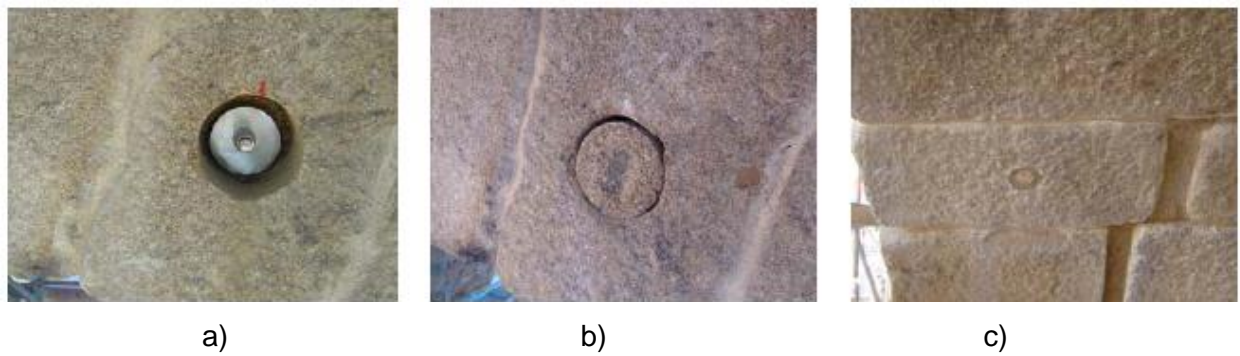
(a) Cylindrical shaped anchor plate used in anchoring; (b) stone cap taken from drilled core; (c) final appearance of neatly plugged anchoring. (Oliveira, 2006).
